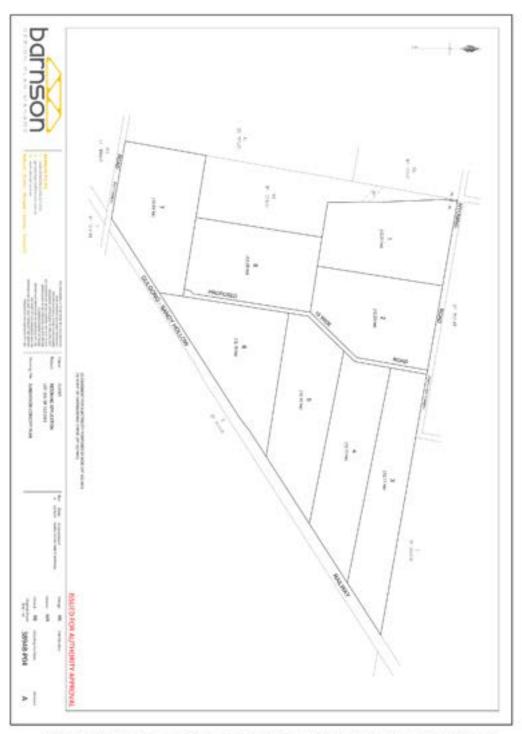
Proposed lot layout for the re-zoning and subdivision of the Subject Site.
